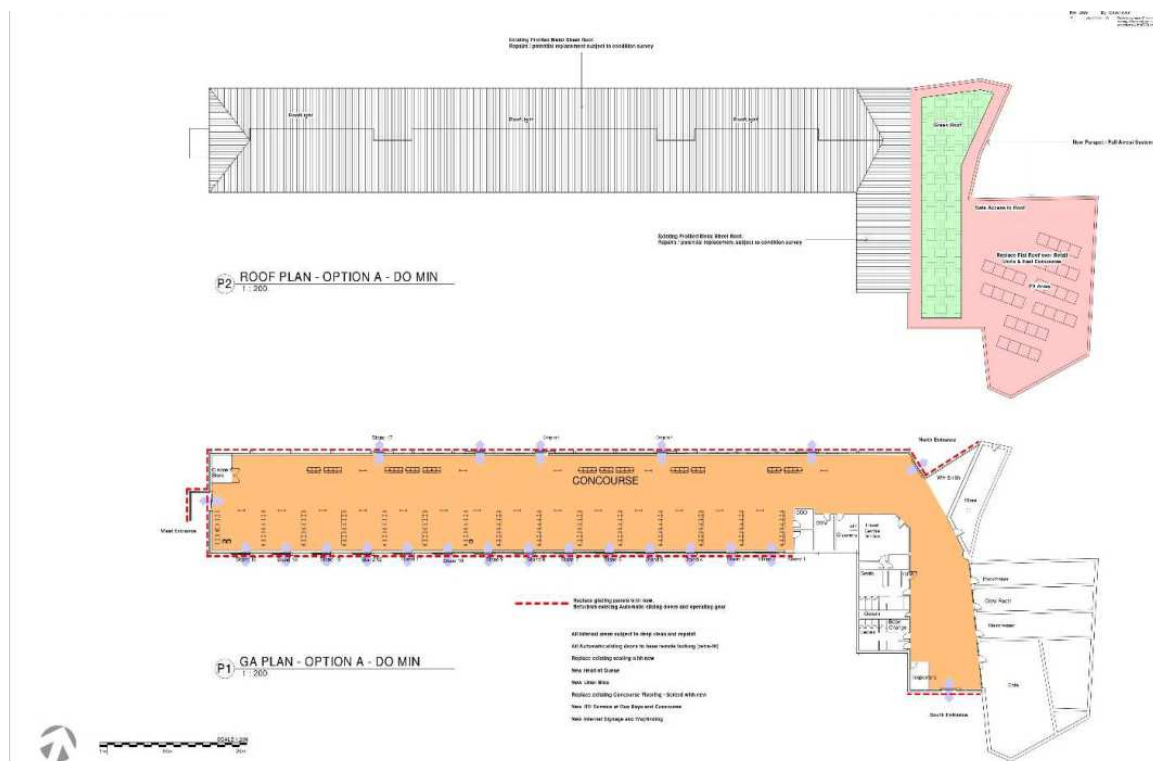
Ground Floor Plan and Roof Plan of Do Minimum Option
